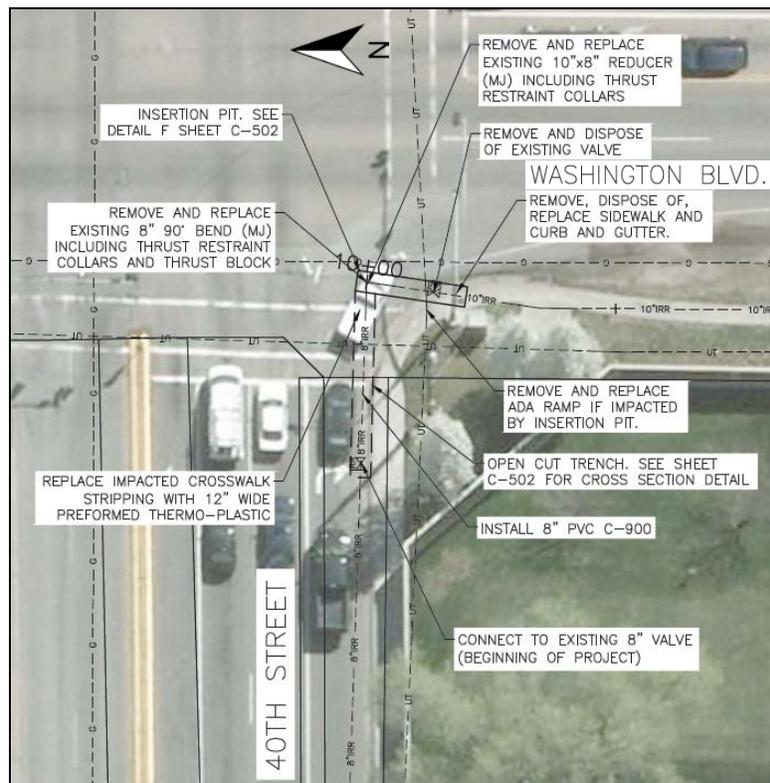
Aerial view of intersection of 40<sup>th</sup> Street and Washington Blvd.
